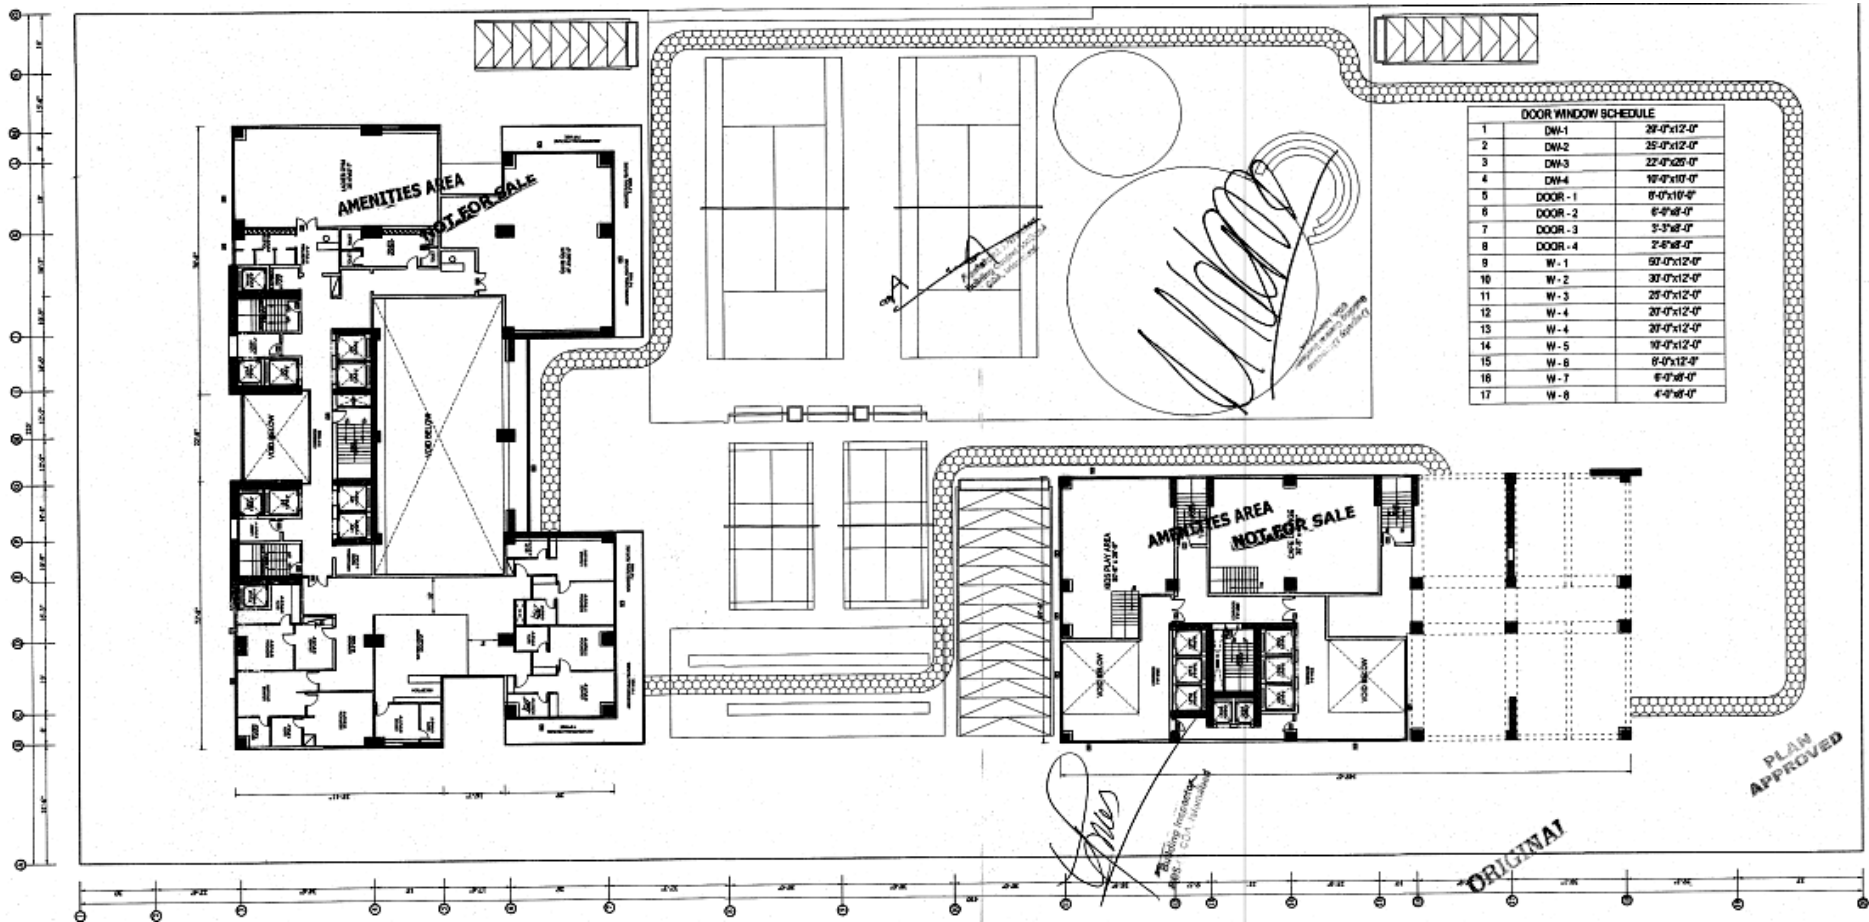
Layout Plan of service and 2nd Floor Tower A/B of The Garden Residence Project, Sector F-10 Markaz, Islamabad
